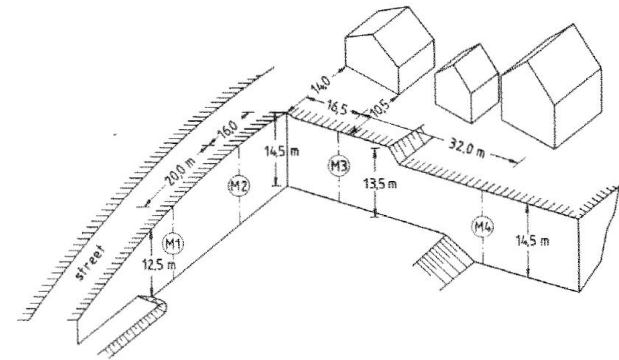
Site and layout of walls (Stocker and Riedinger, 1990)
